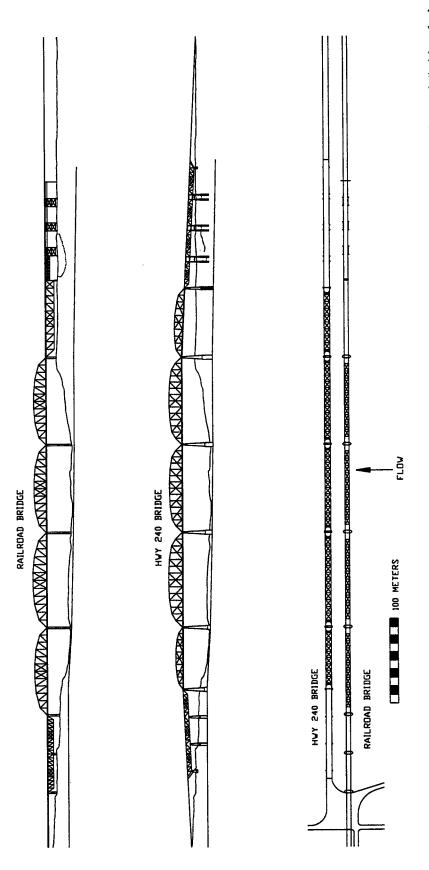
Downstream view of Missouri Highway 240 highway bridge and railroad bridge, near Glasgow, Missouri (bridge design courtesy of Missouri Highway and Transportation Department).
